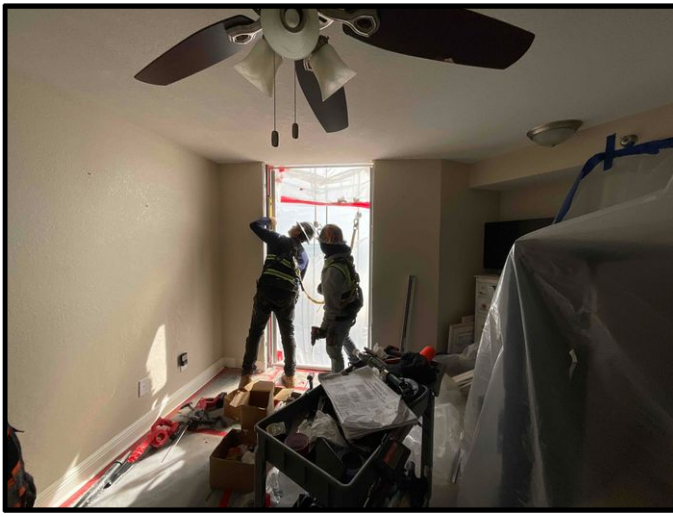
East Elevation - Bedroom Window - Unit No. 700 - View of window replacement - Work in Progress.
